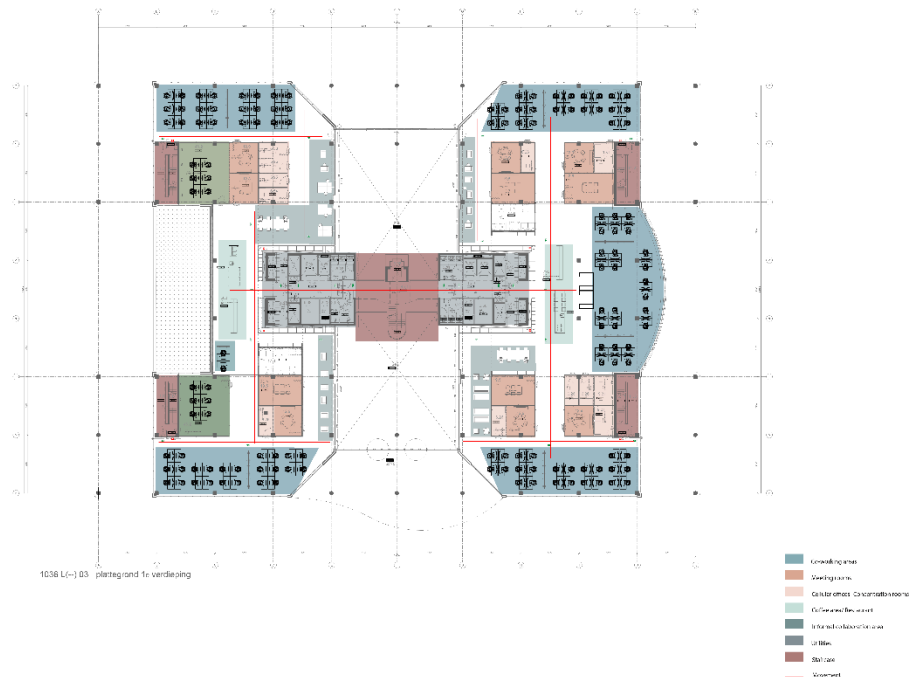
Annotated floor plan of Building 1. First office floor. Source: Netherlands Police Real Estate Department; colour-coding by author.
